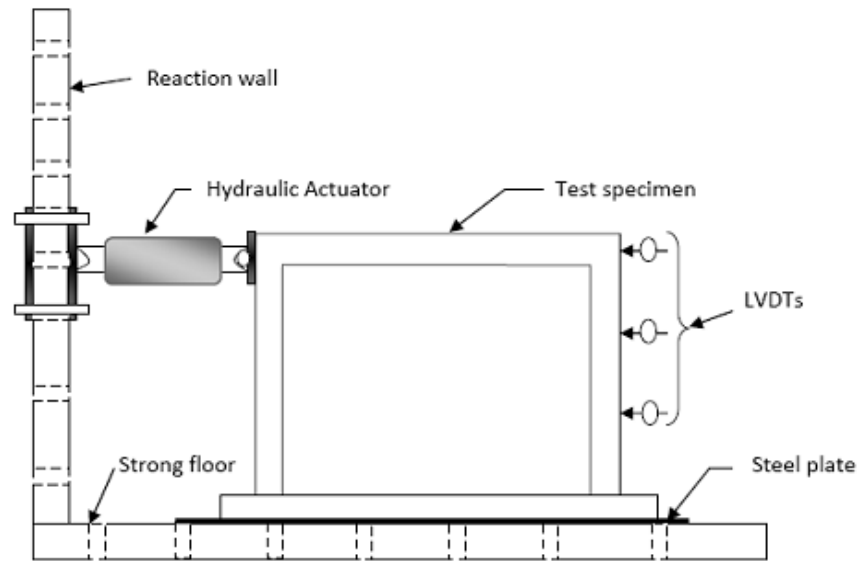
The pushover test set-up for the reinforced concrete frame (Paul and Agarwal, 2012)
